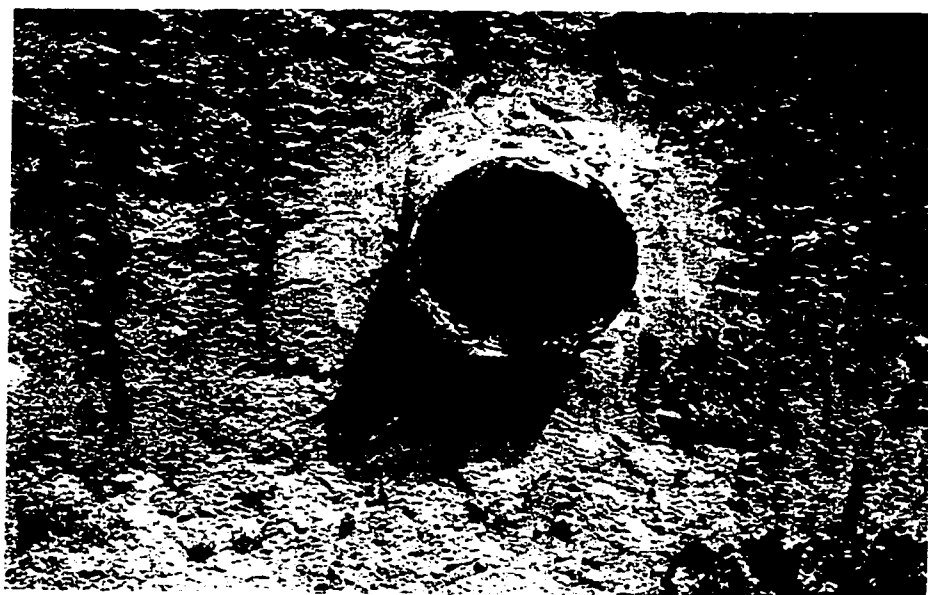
One Week Excavation of 100mm Pipe in Clay
